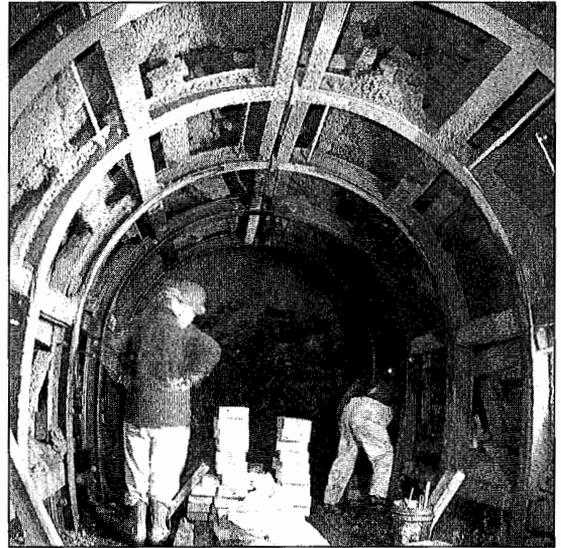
The installation of ribs and lagging in the WRI adit.
